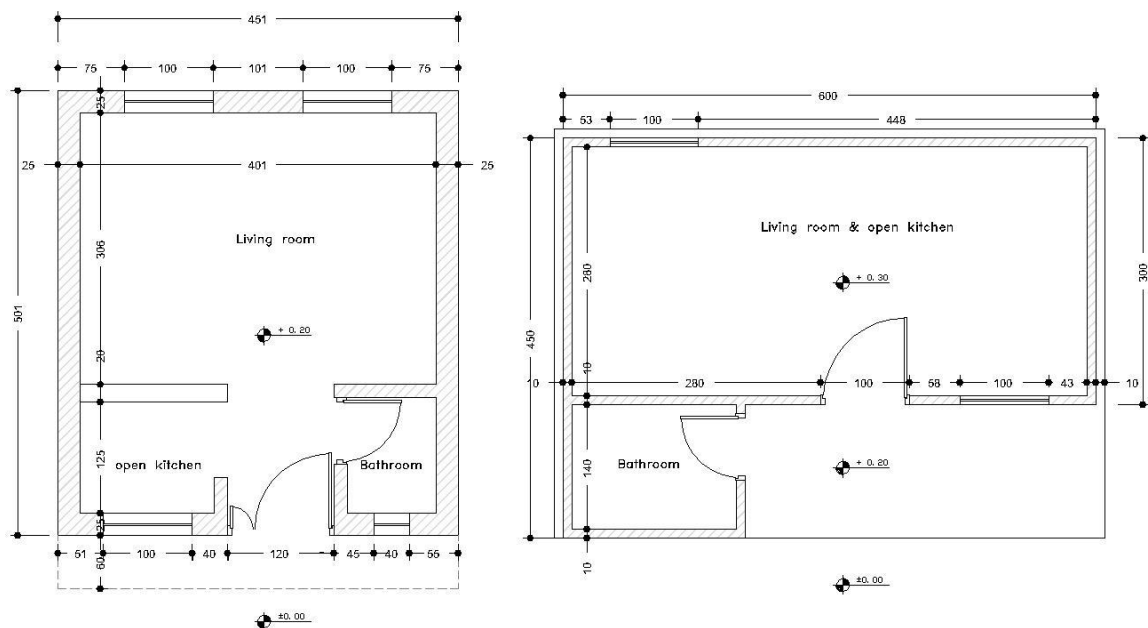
Plan of a THU constructed in Bam after the 2003 earthquake; the left plan is the 20 m² type and the right plan is the 18 m² type
